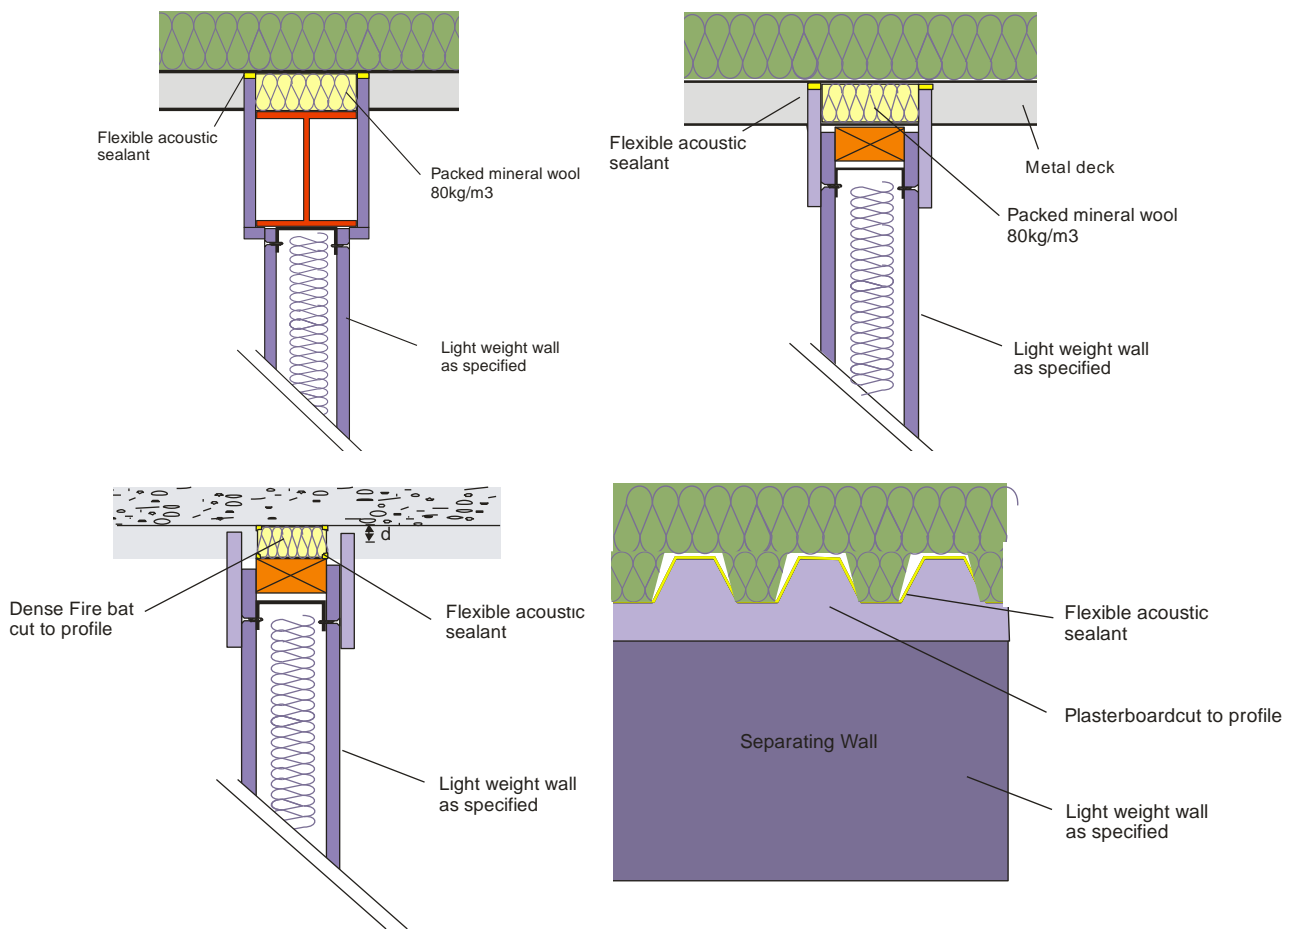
Head detail when the metal deck runs perpendicular to the wall (section view)
